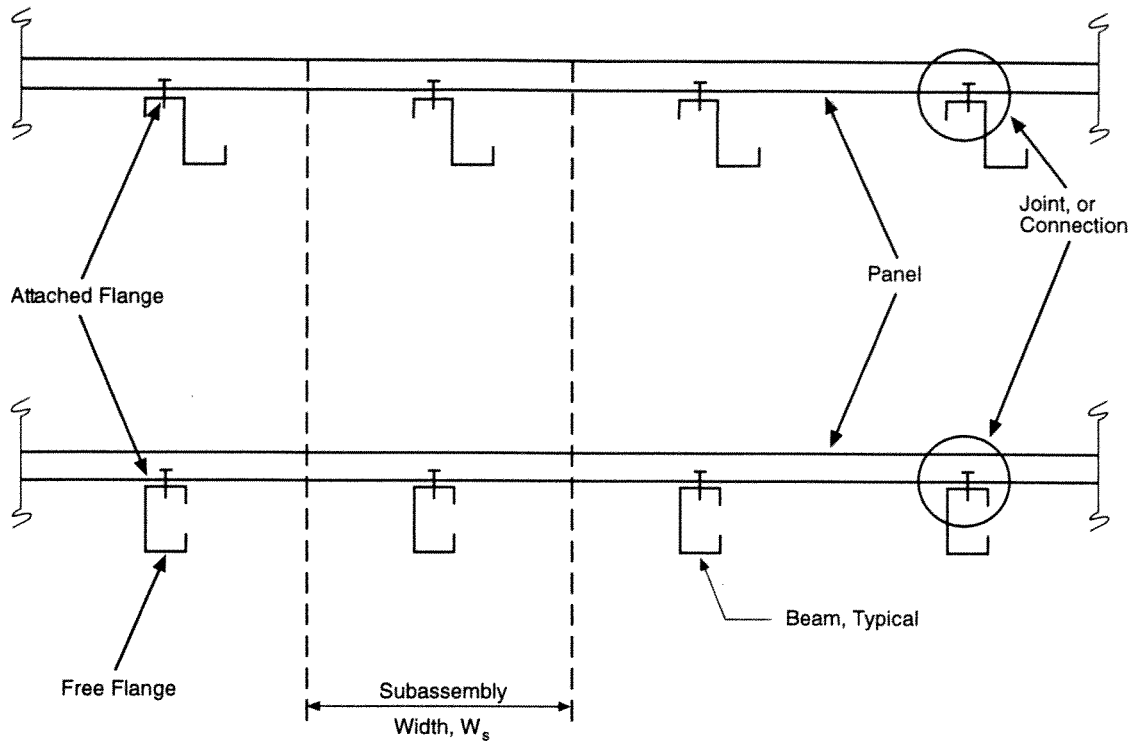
Wall, Floor, Ceiling or Roof Assembly
